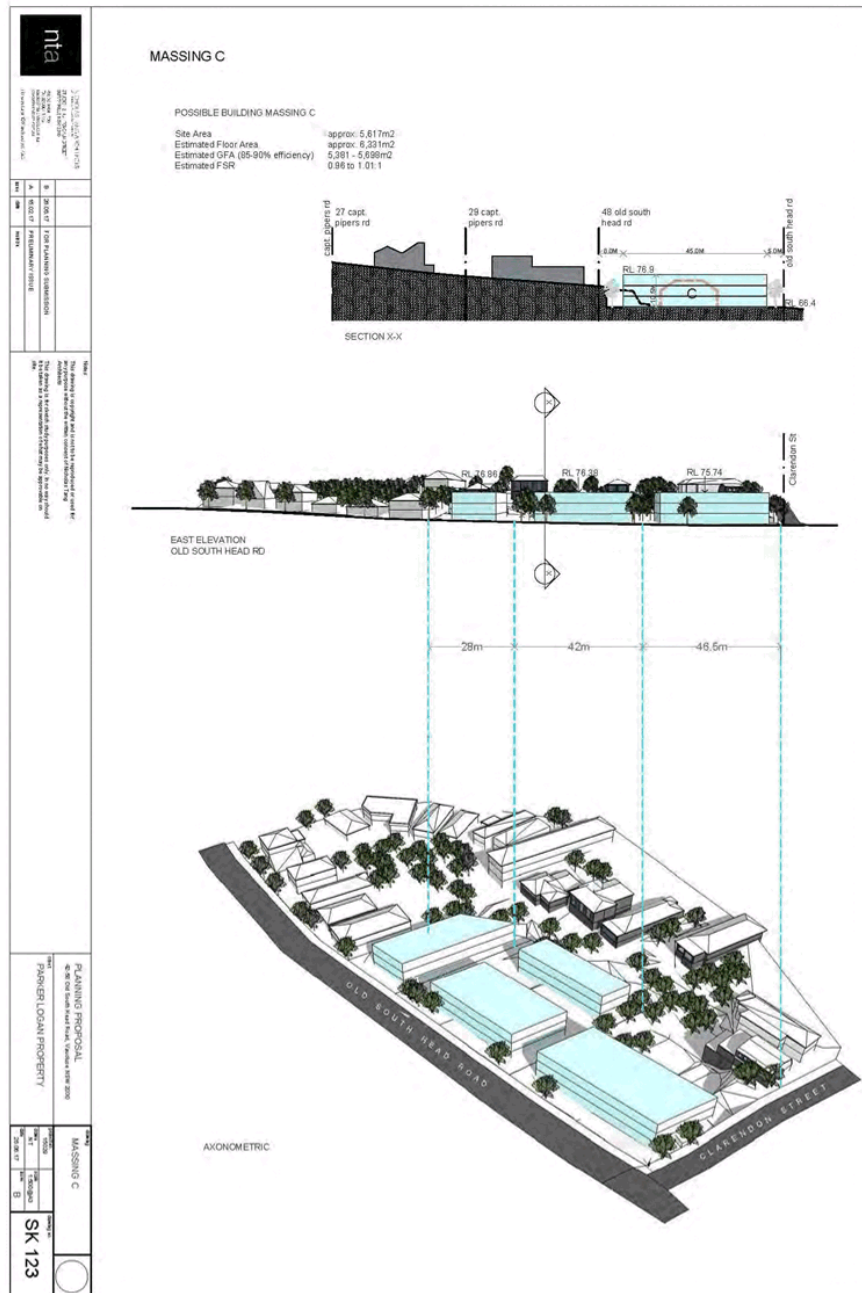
Building massing concept C (source: Nicholas Tang Architects)
